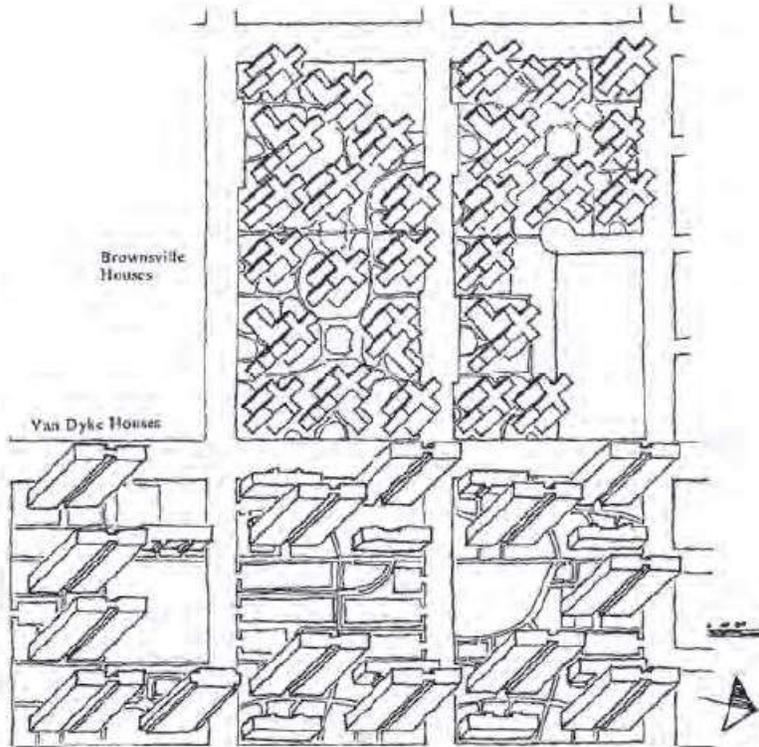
Plans of Brownsville and Van Dyke houses. Courtesy of Oscar Newman.
